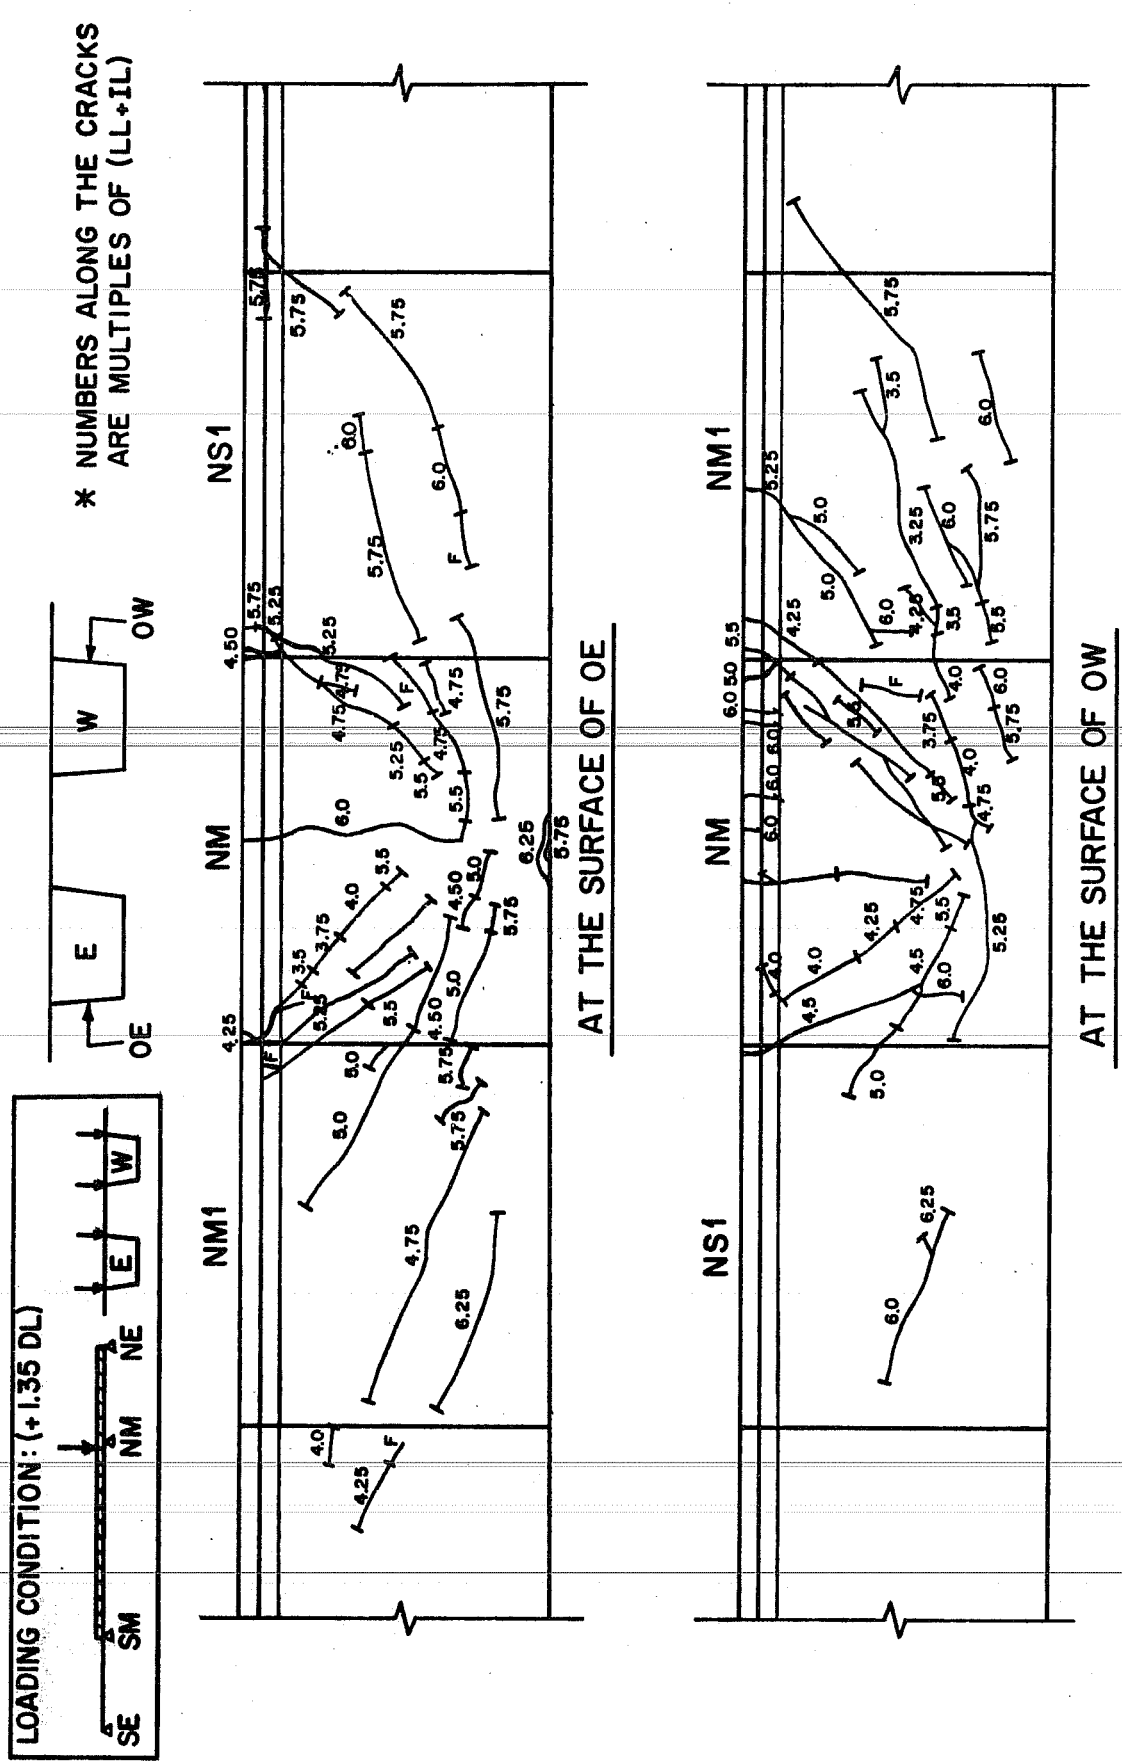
Development of cracks around NM pier during loading to failure
